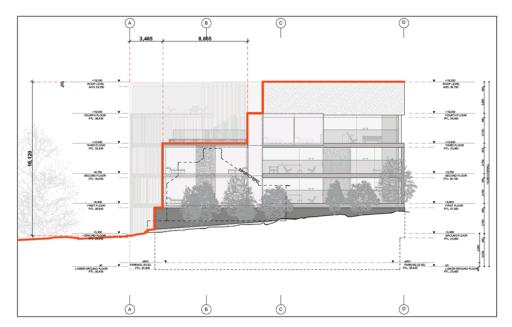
Southern elevation showing height transition and setback from Wilmot Street (source: Room 11 Architects)
